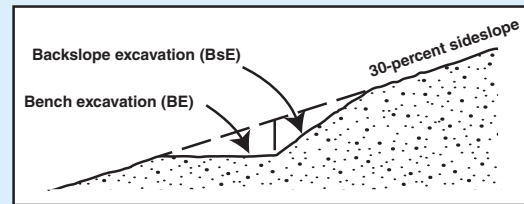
Terms used when estimating excavation volumes for full bench construction.
